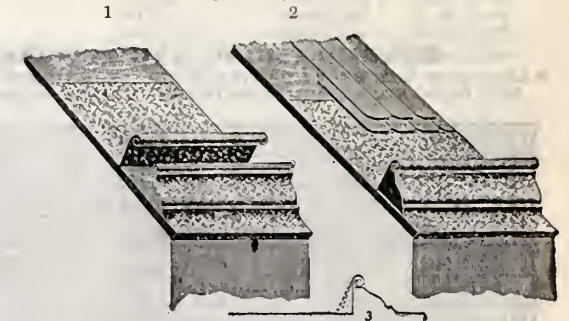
shows Face Moulding to which Gutter is to be attached. Fig. 2 shows Face Moulding and Gutter locked together and in position. Fig. 3 shows different positions of Gutter Apron to give the required fall.
